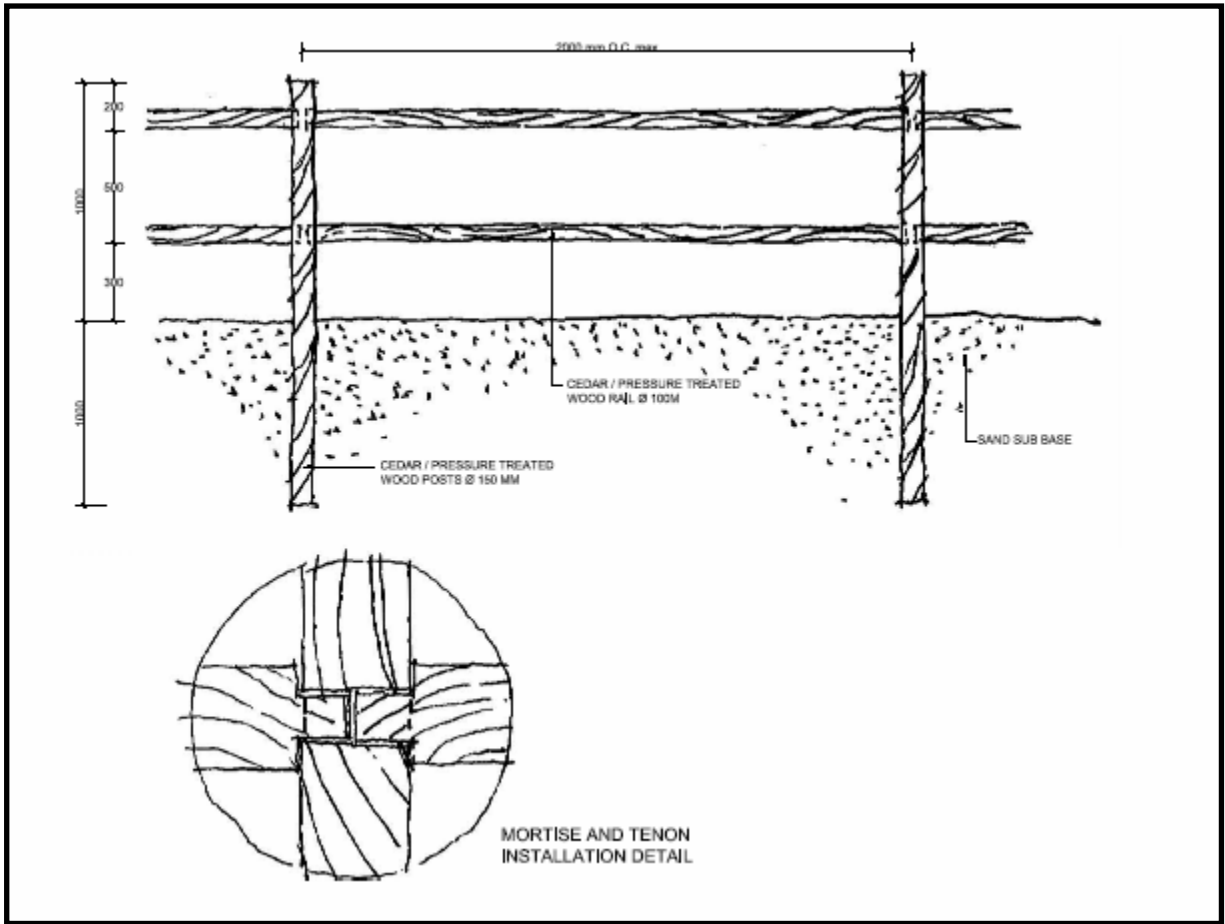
Farm fencing detail between beach and dune system and for the end of Trew Avenue
